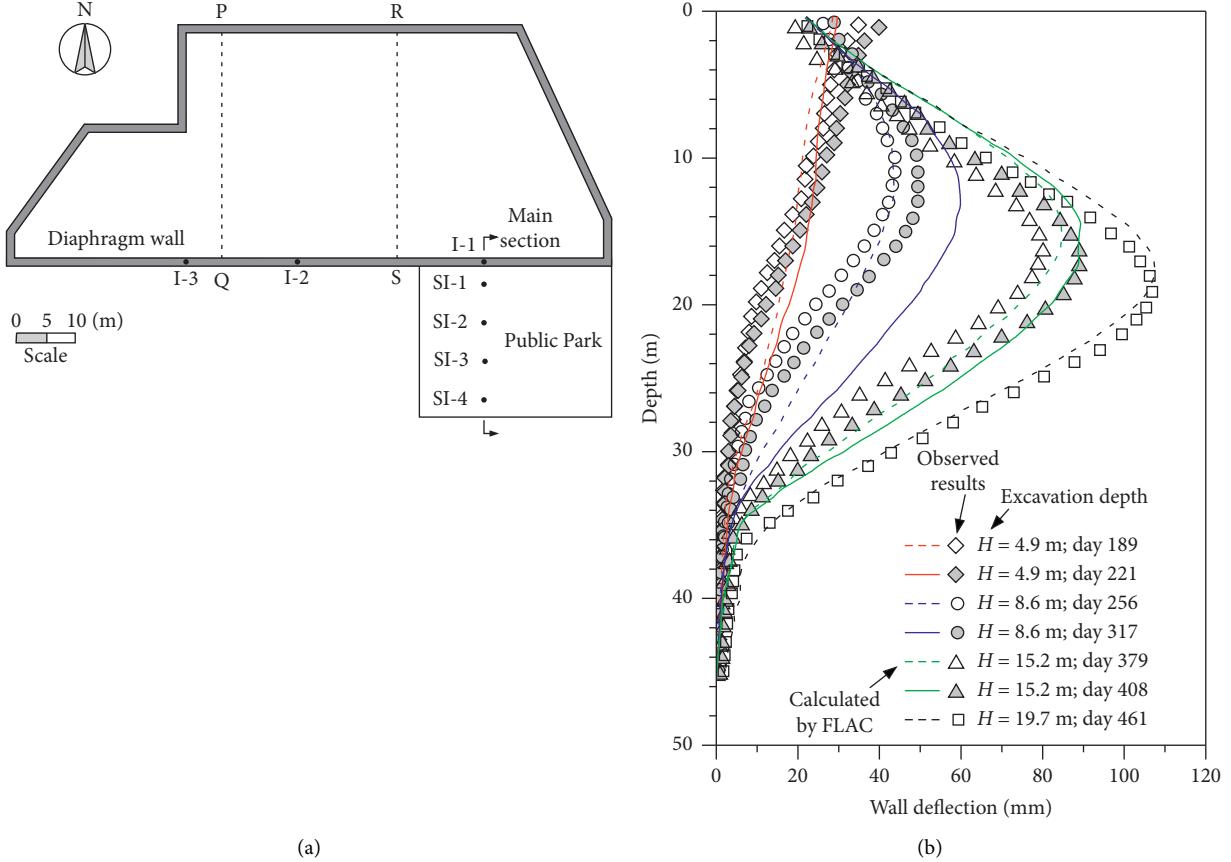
The TNEC excavation project: (a) instrumentation layout; (b) comparison of observed and calculated lateral wall deflections at typical excavation depths, modified from [31].
